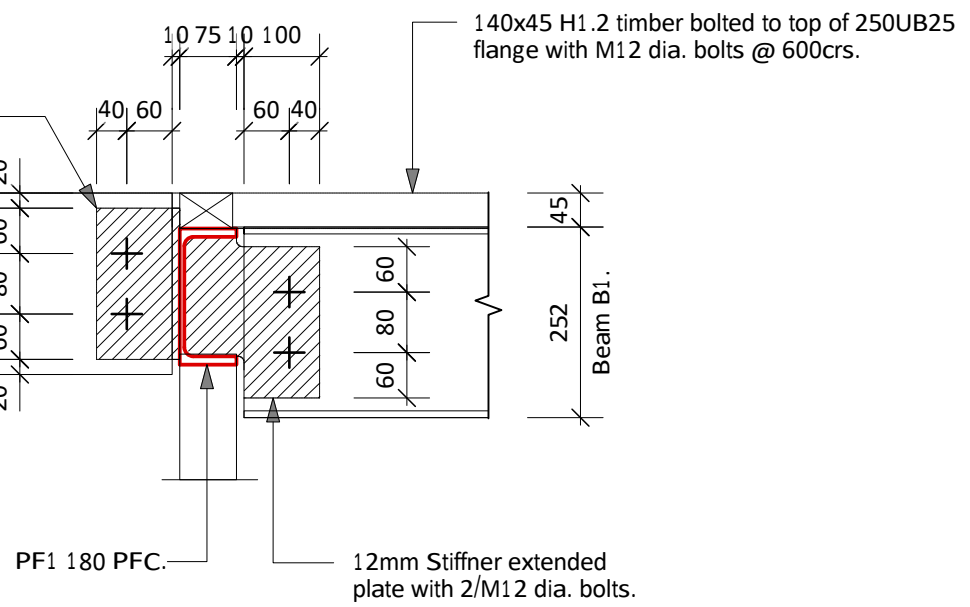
DETAIL-Y PFC COLUMN TO BOUNDRY JOIST & BEARER CONNECTION DETAIL
